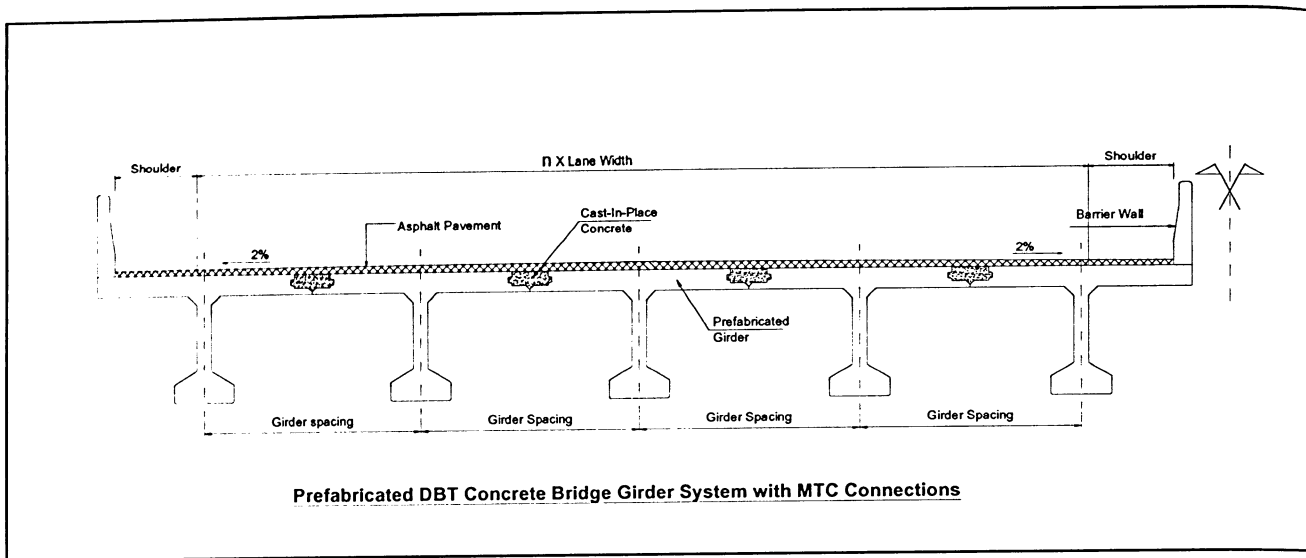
Cross-Section of Prefabricated DBT Bridge Girder System with MTC Connection
